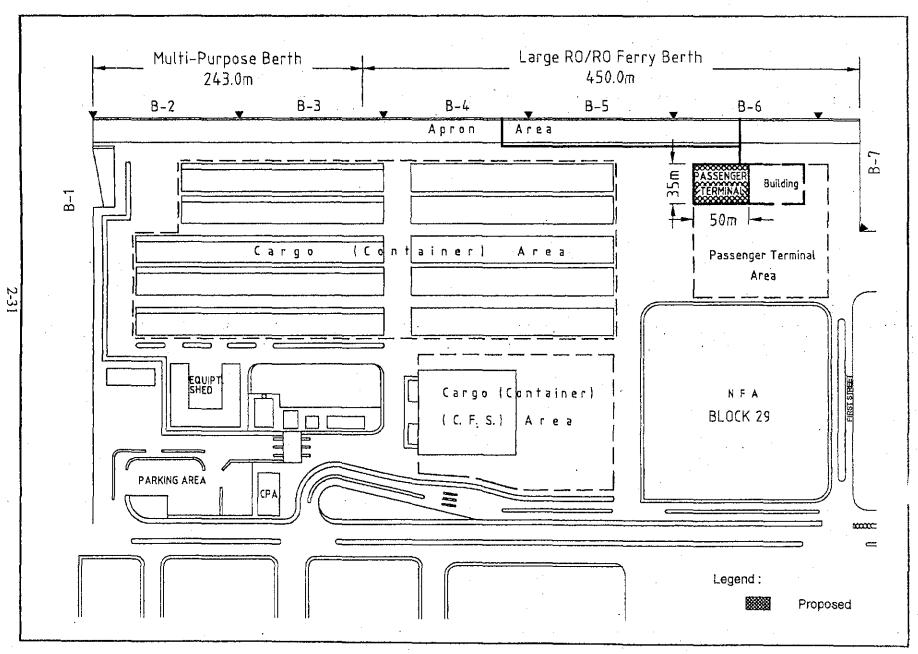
Short-term Development Plan (2010: PMO 1)
